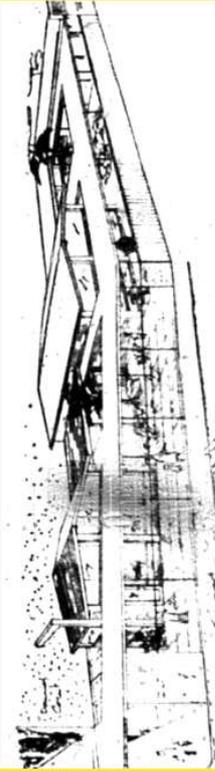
Scheme by architects Morrish, Nelson & Vaughan, for office block at 67 Murrumbena Road. (Source: Herald, 9 December 1960)
